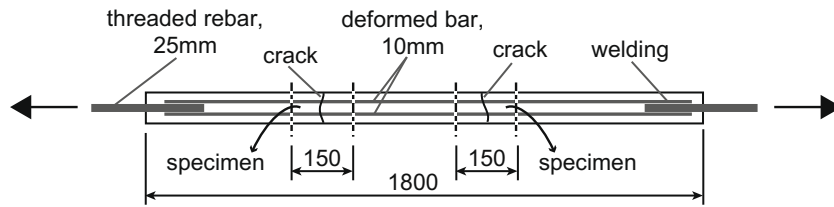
Method of generating cracks in the beam (unit: mm).
